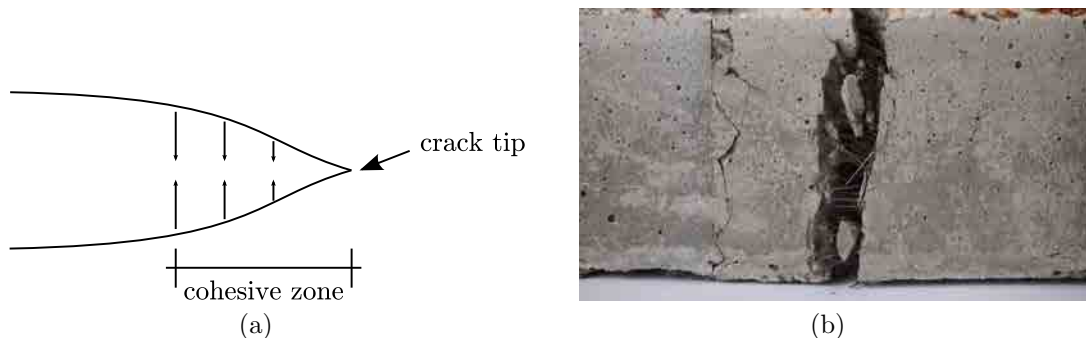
(a) A cohesive crack can be used to model (b) steel-fibre reinforced concrete beams (courtesy of Climent Molins, UPC).
